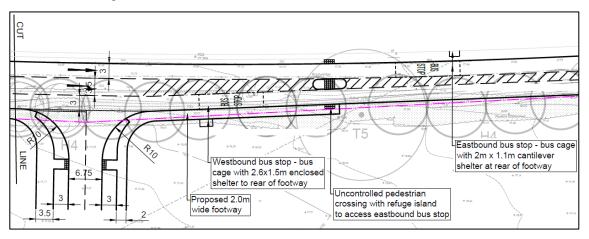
Proposed bus stops on Radwinter Road to the east of the proposed Site entrance. This plan also indicates the proposed vehicular, pedestrian and cycle access via Radwinter Road.
